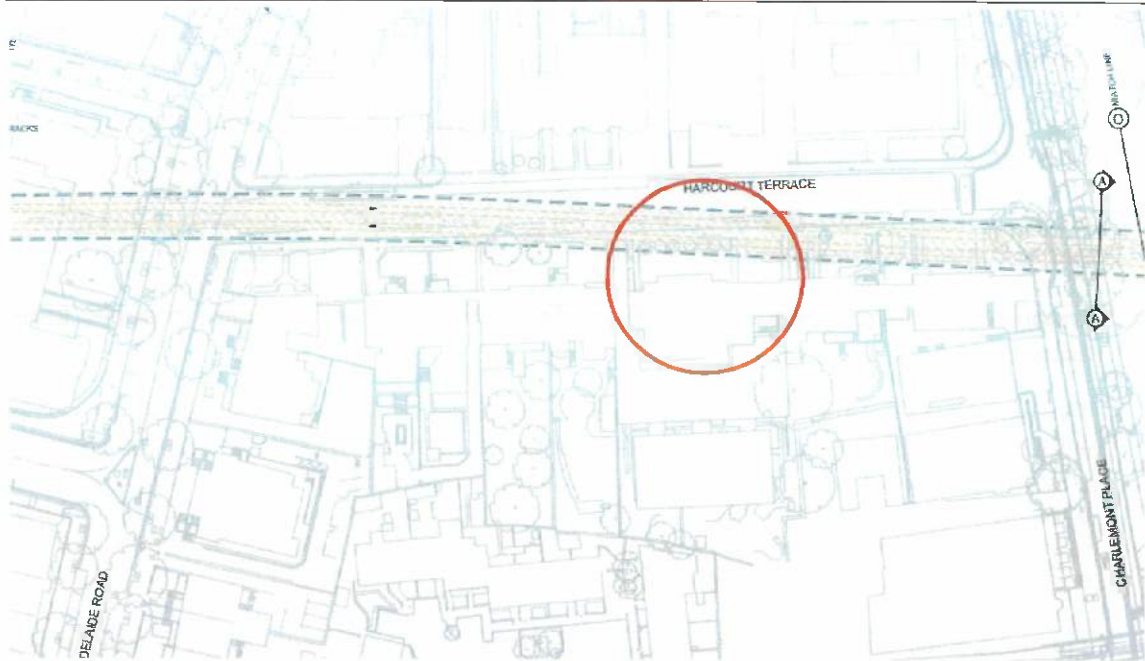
Proximity of the MetroLink line to the subject site (Source: metrolink.ie)
